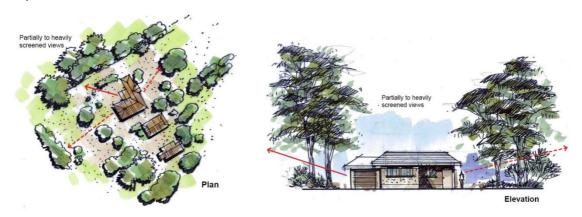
Typology 2 - Partially screened. Typical plan and elevation.
